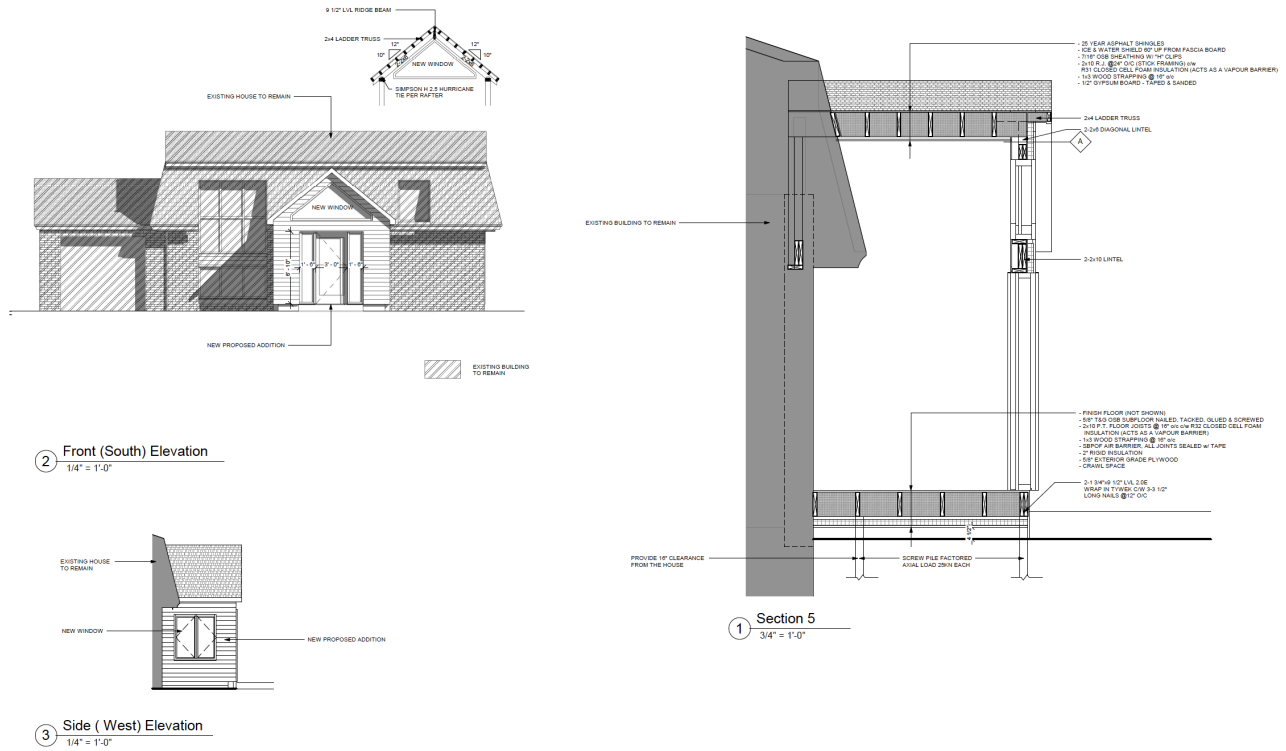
Front Elevation (top left), Side Elevations (bottom left), and Section (Source: Redline Architecture)
